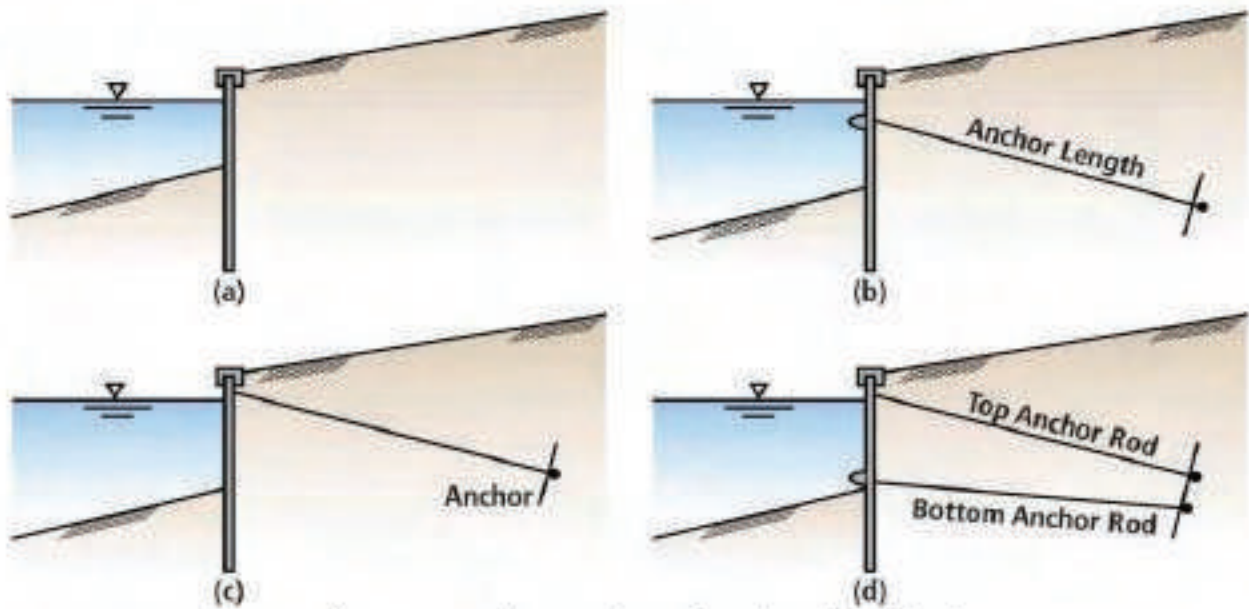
Anchorage Schemes for a Sheet Pile Bulkhead
